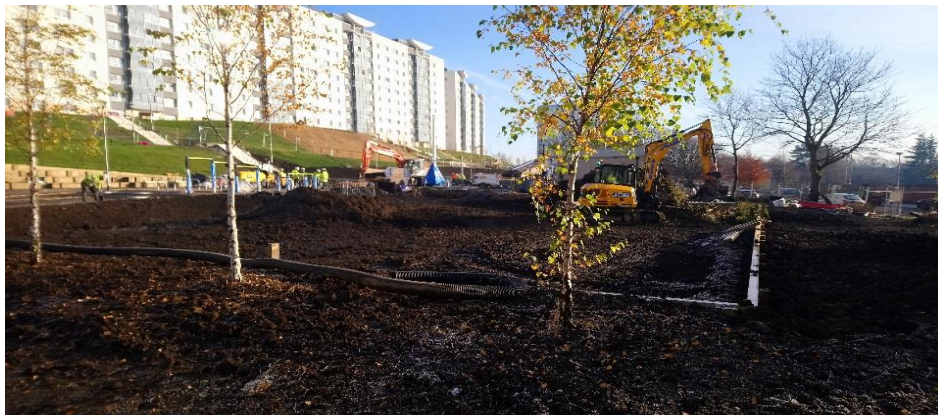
View from the raingardens, down the slope to the play areas, football pitch / storage area and basin.
